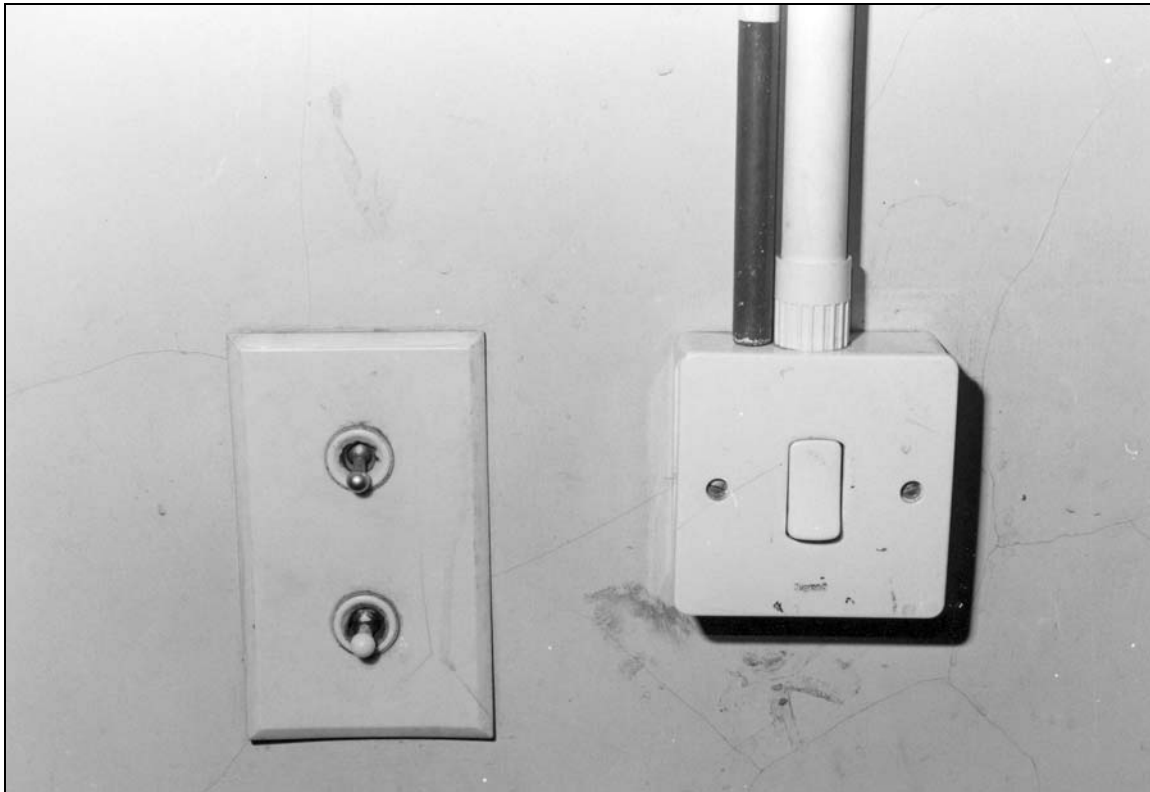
Detail of original and later light switches in “dirty” lobby (film 6, frame 16)
